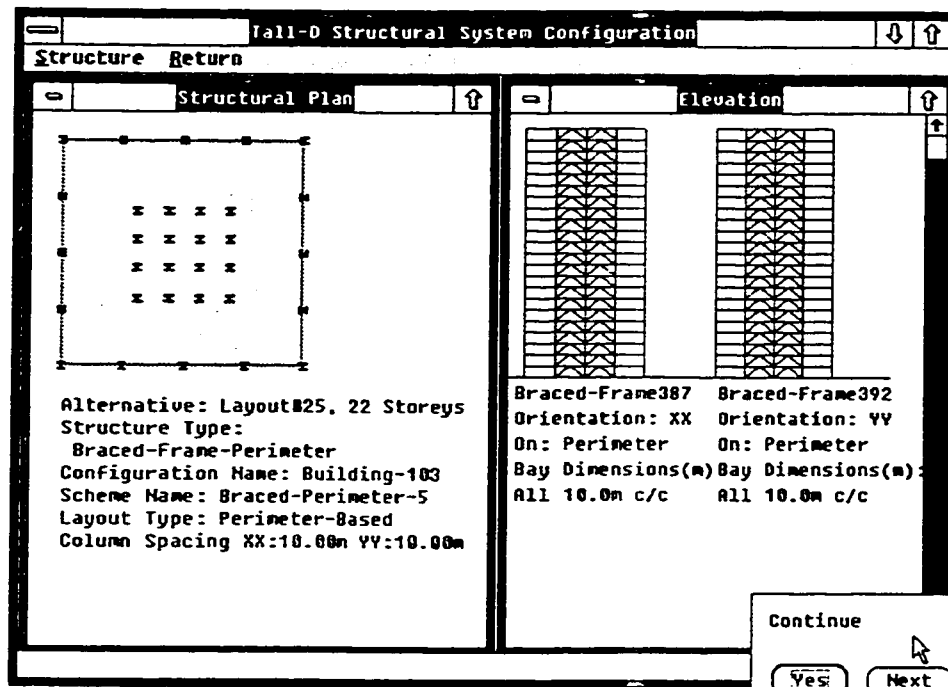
(f) Braced frame structural alternative for Layout#25: Braces located on the perimeter. Perimeter column spacing 10m.
